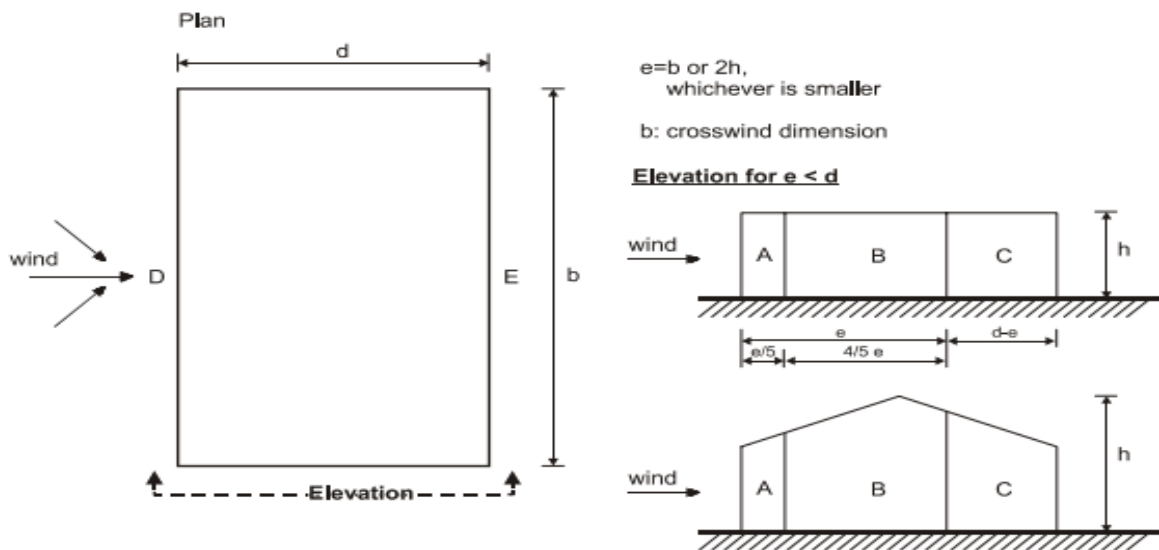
wind loading keys on vertical wall (Source:-Pr EN 1991-1-4)
